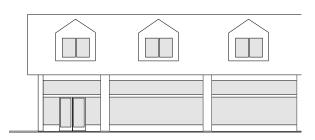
(7) Pitched Roof on Single Story Commercial Center
